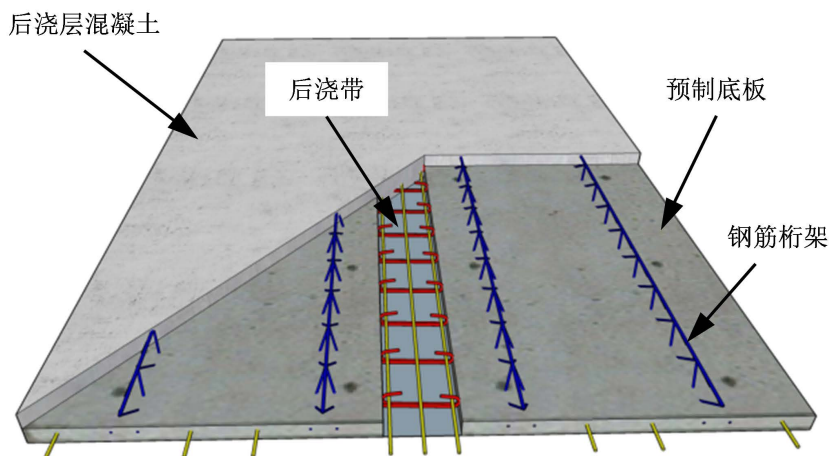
Prefabricated reinforced truss concrete composite slab construction
